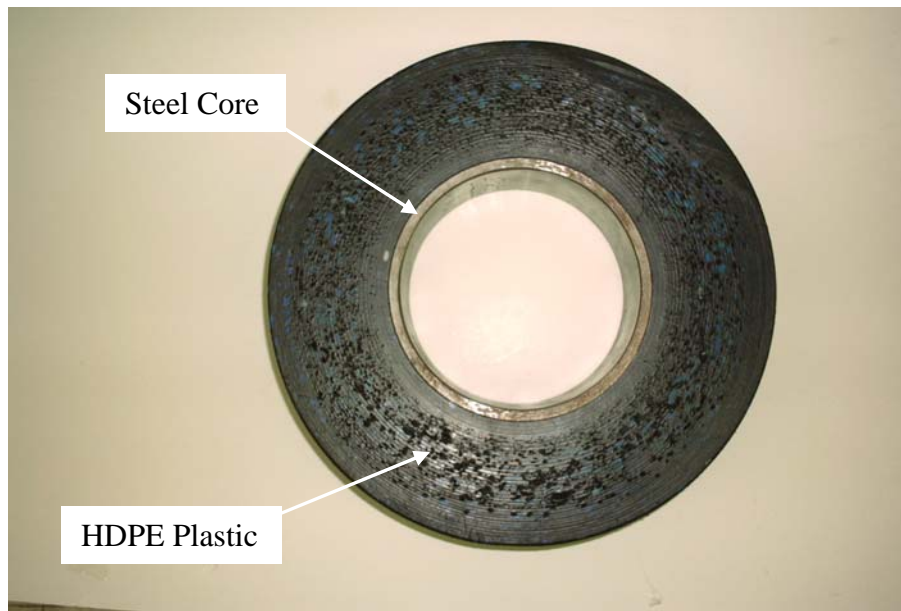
Steel core piling manufactured by Plastic Pilings, Inc.
